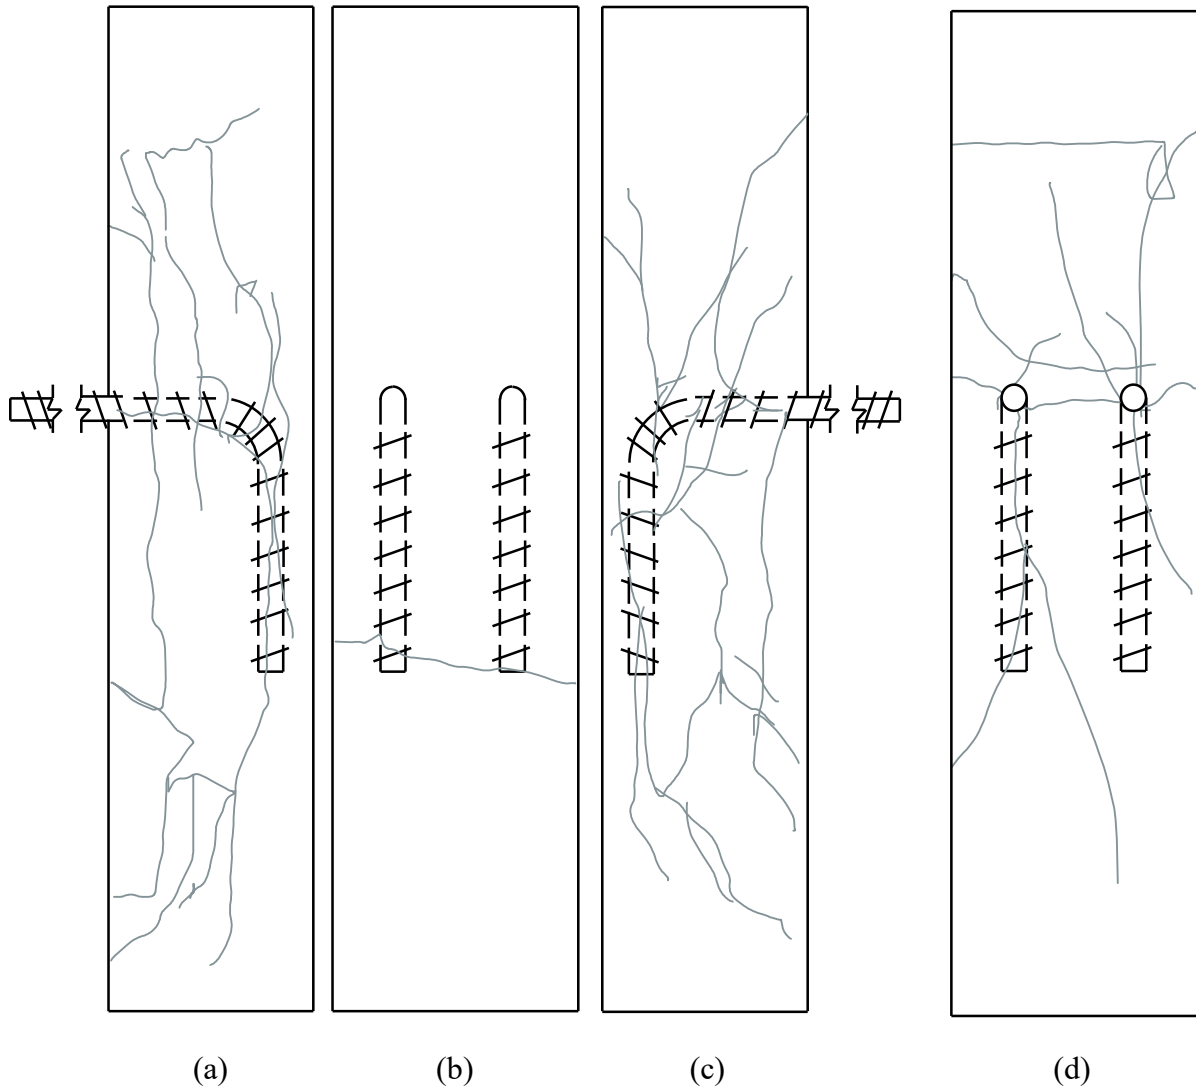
Crack pattern at maximum normalized tensile load for beam-column joint specimen MD3-90: (a) west side face, (b) back face, (c) east side face, and (d) front face
